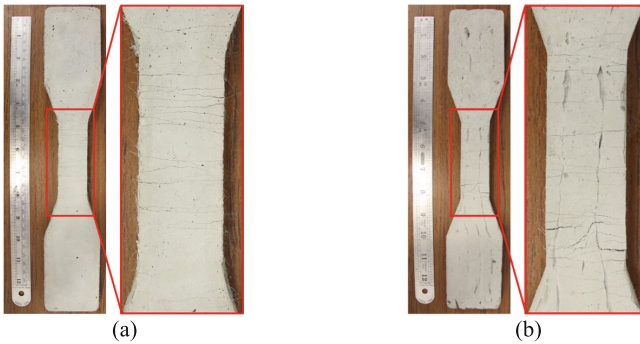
Multiple cracking is exhibited in PC-ECC: (a) cast specimen and (b) printed specimen.
